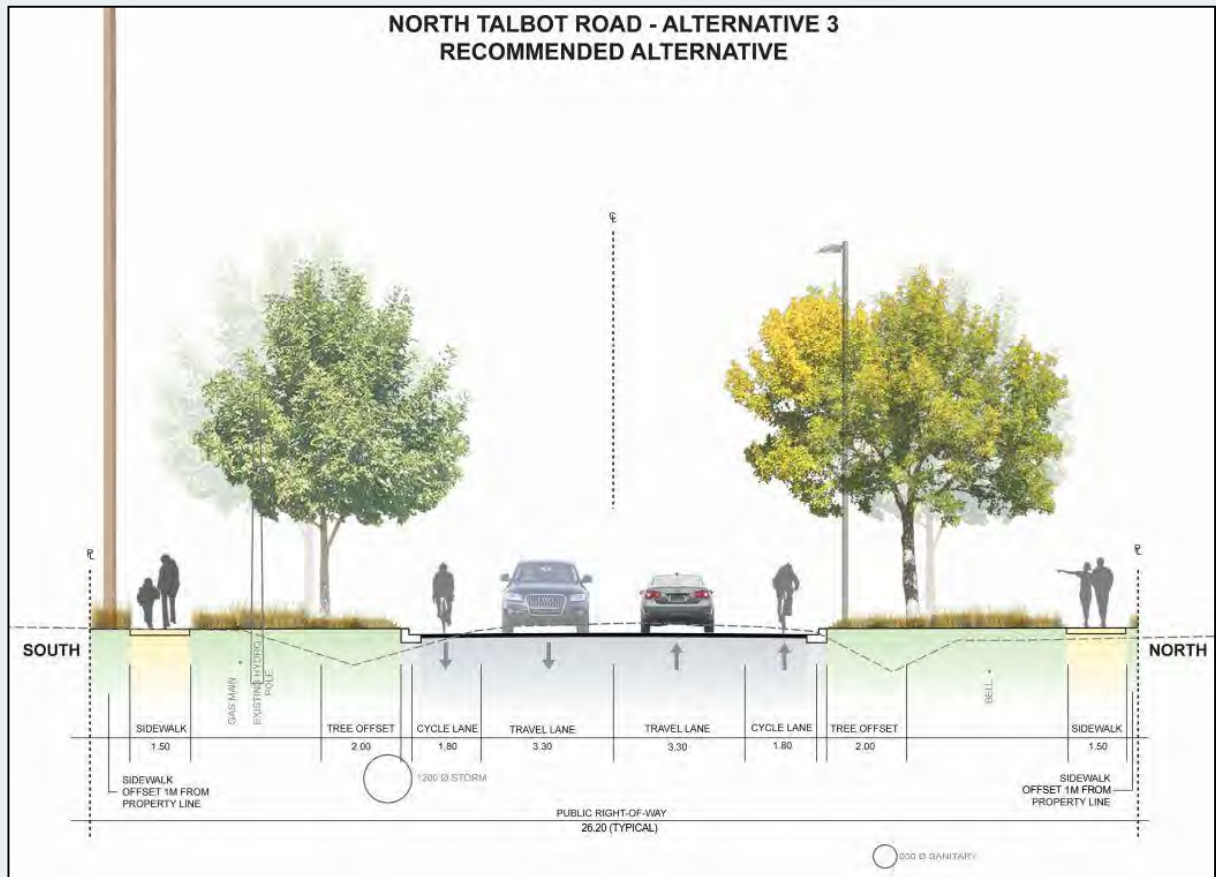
ALTERNATIVE 3 – NORTH TALBOT ROAD
